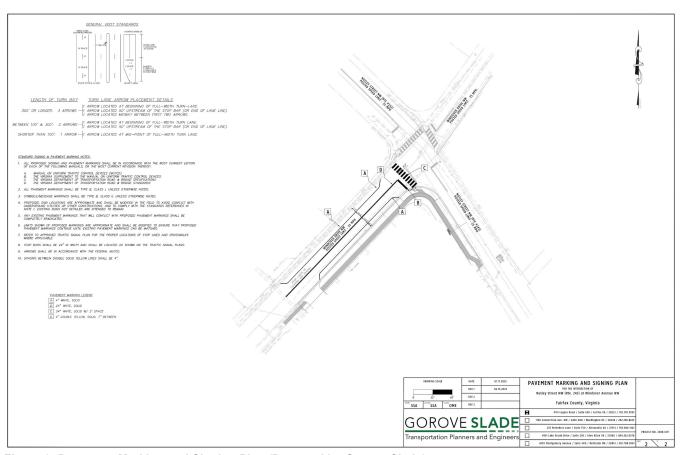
Pavement Marking and Signing Plan (Prepared by Gorove Slade)
